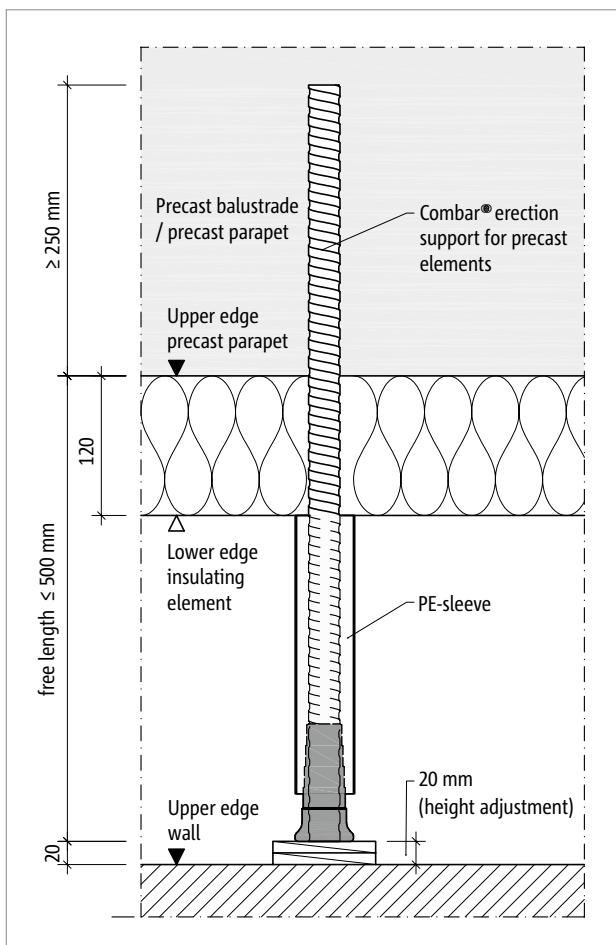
Schöck Combar® erection support for precast elements: planning dimensions
